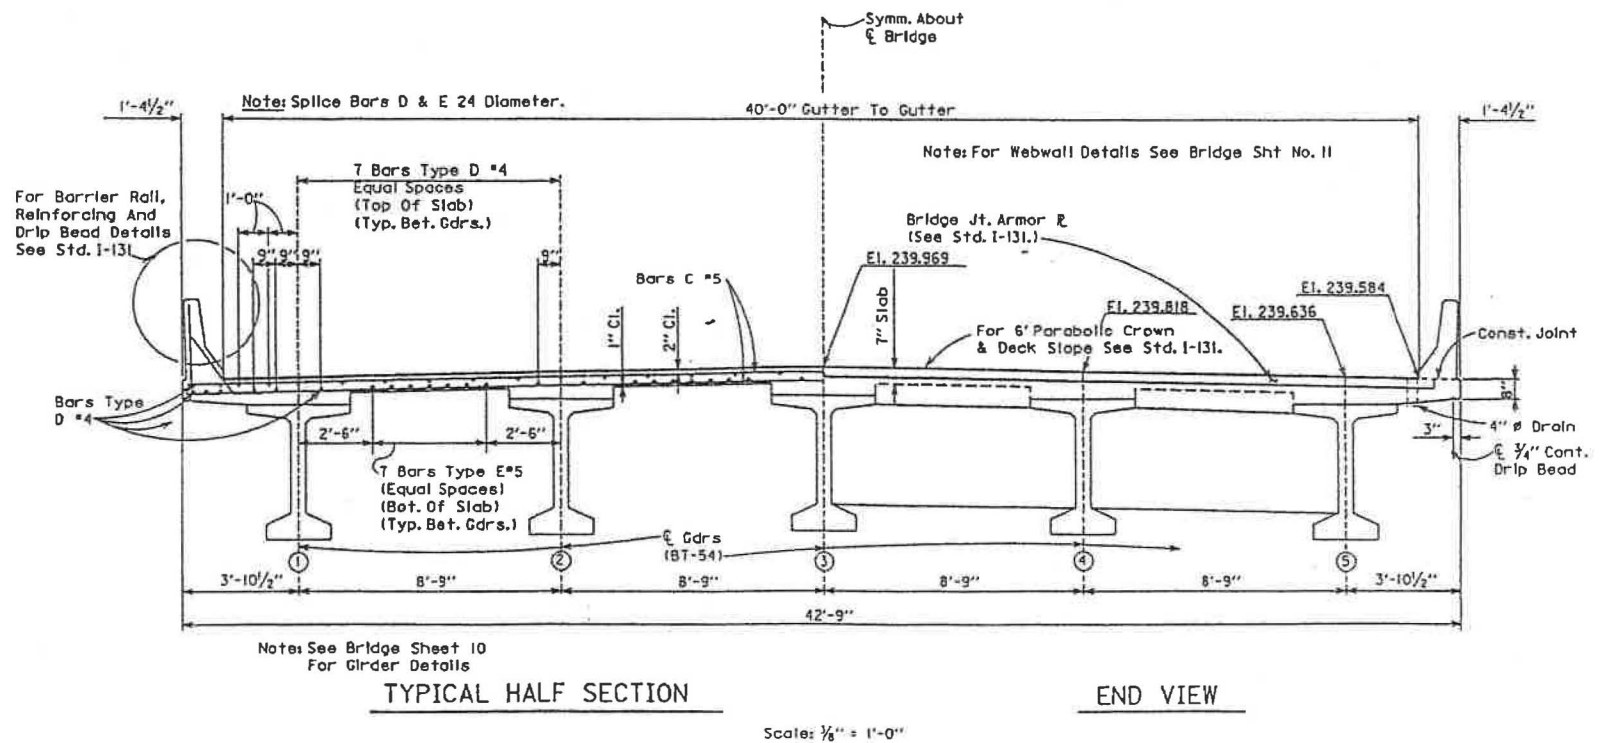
Cross Section of the Uphapee Creek Bridge
